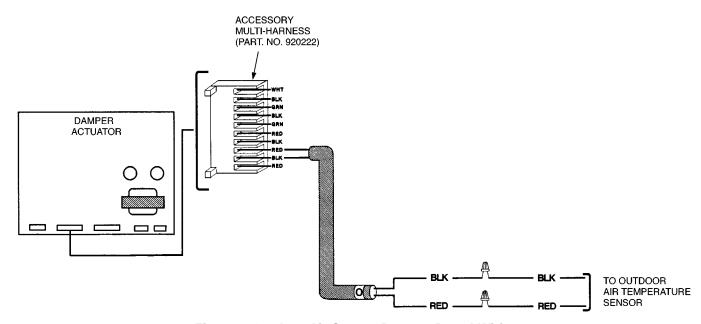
Outdoor Air Sensor Damper Board Wiring
